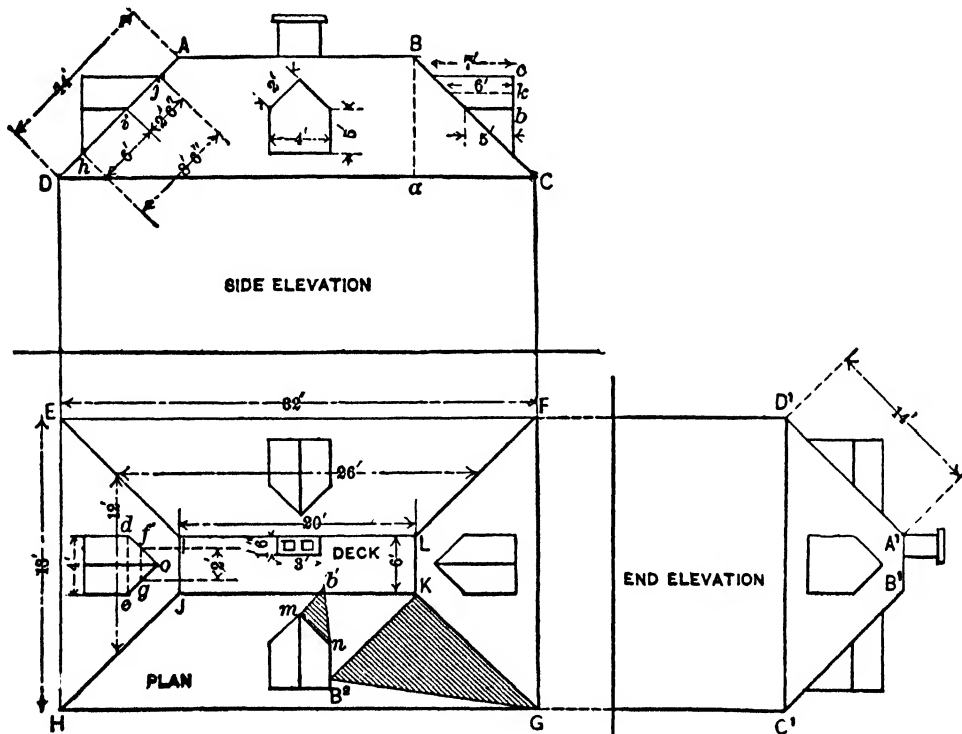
Plan and Elevation of Mansard Roof with Deck and Dormers
